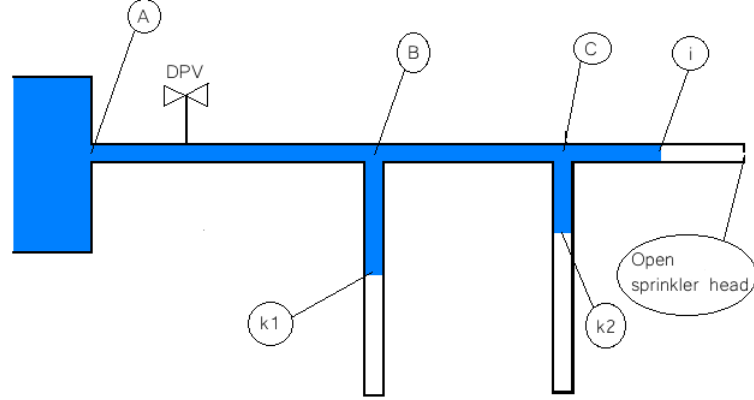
The water columns in the final stage of the water transit. All the pipes contain a water column in the final stage.
